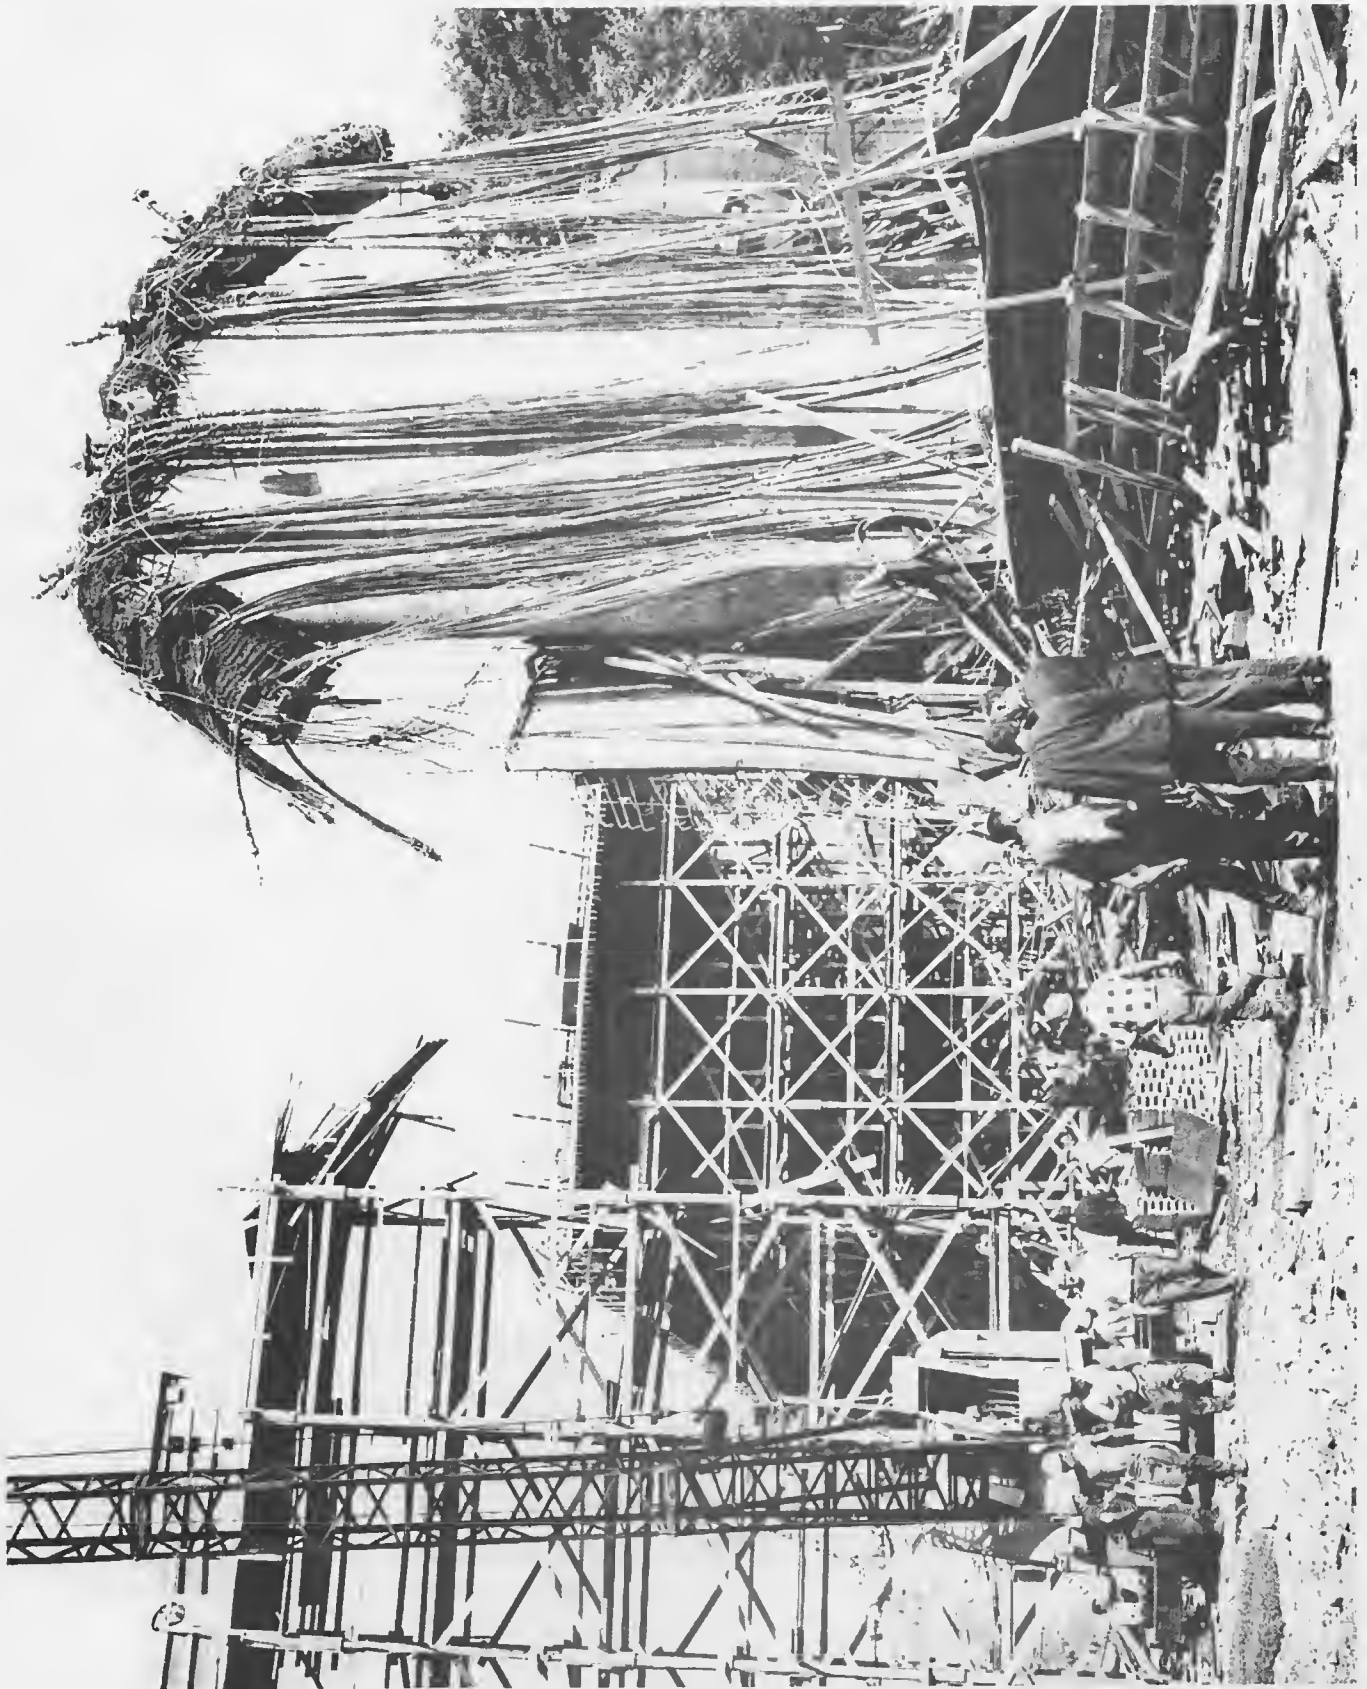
Heron Road Bridge after the Collapse (from D-W Photos)
